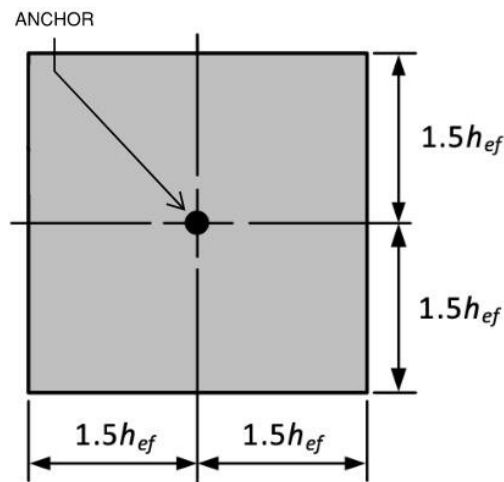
Plan view of concrete breakout surface according to the CCD method (adapted from CSA (2019))
